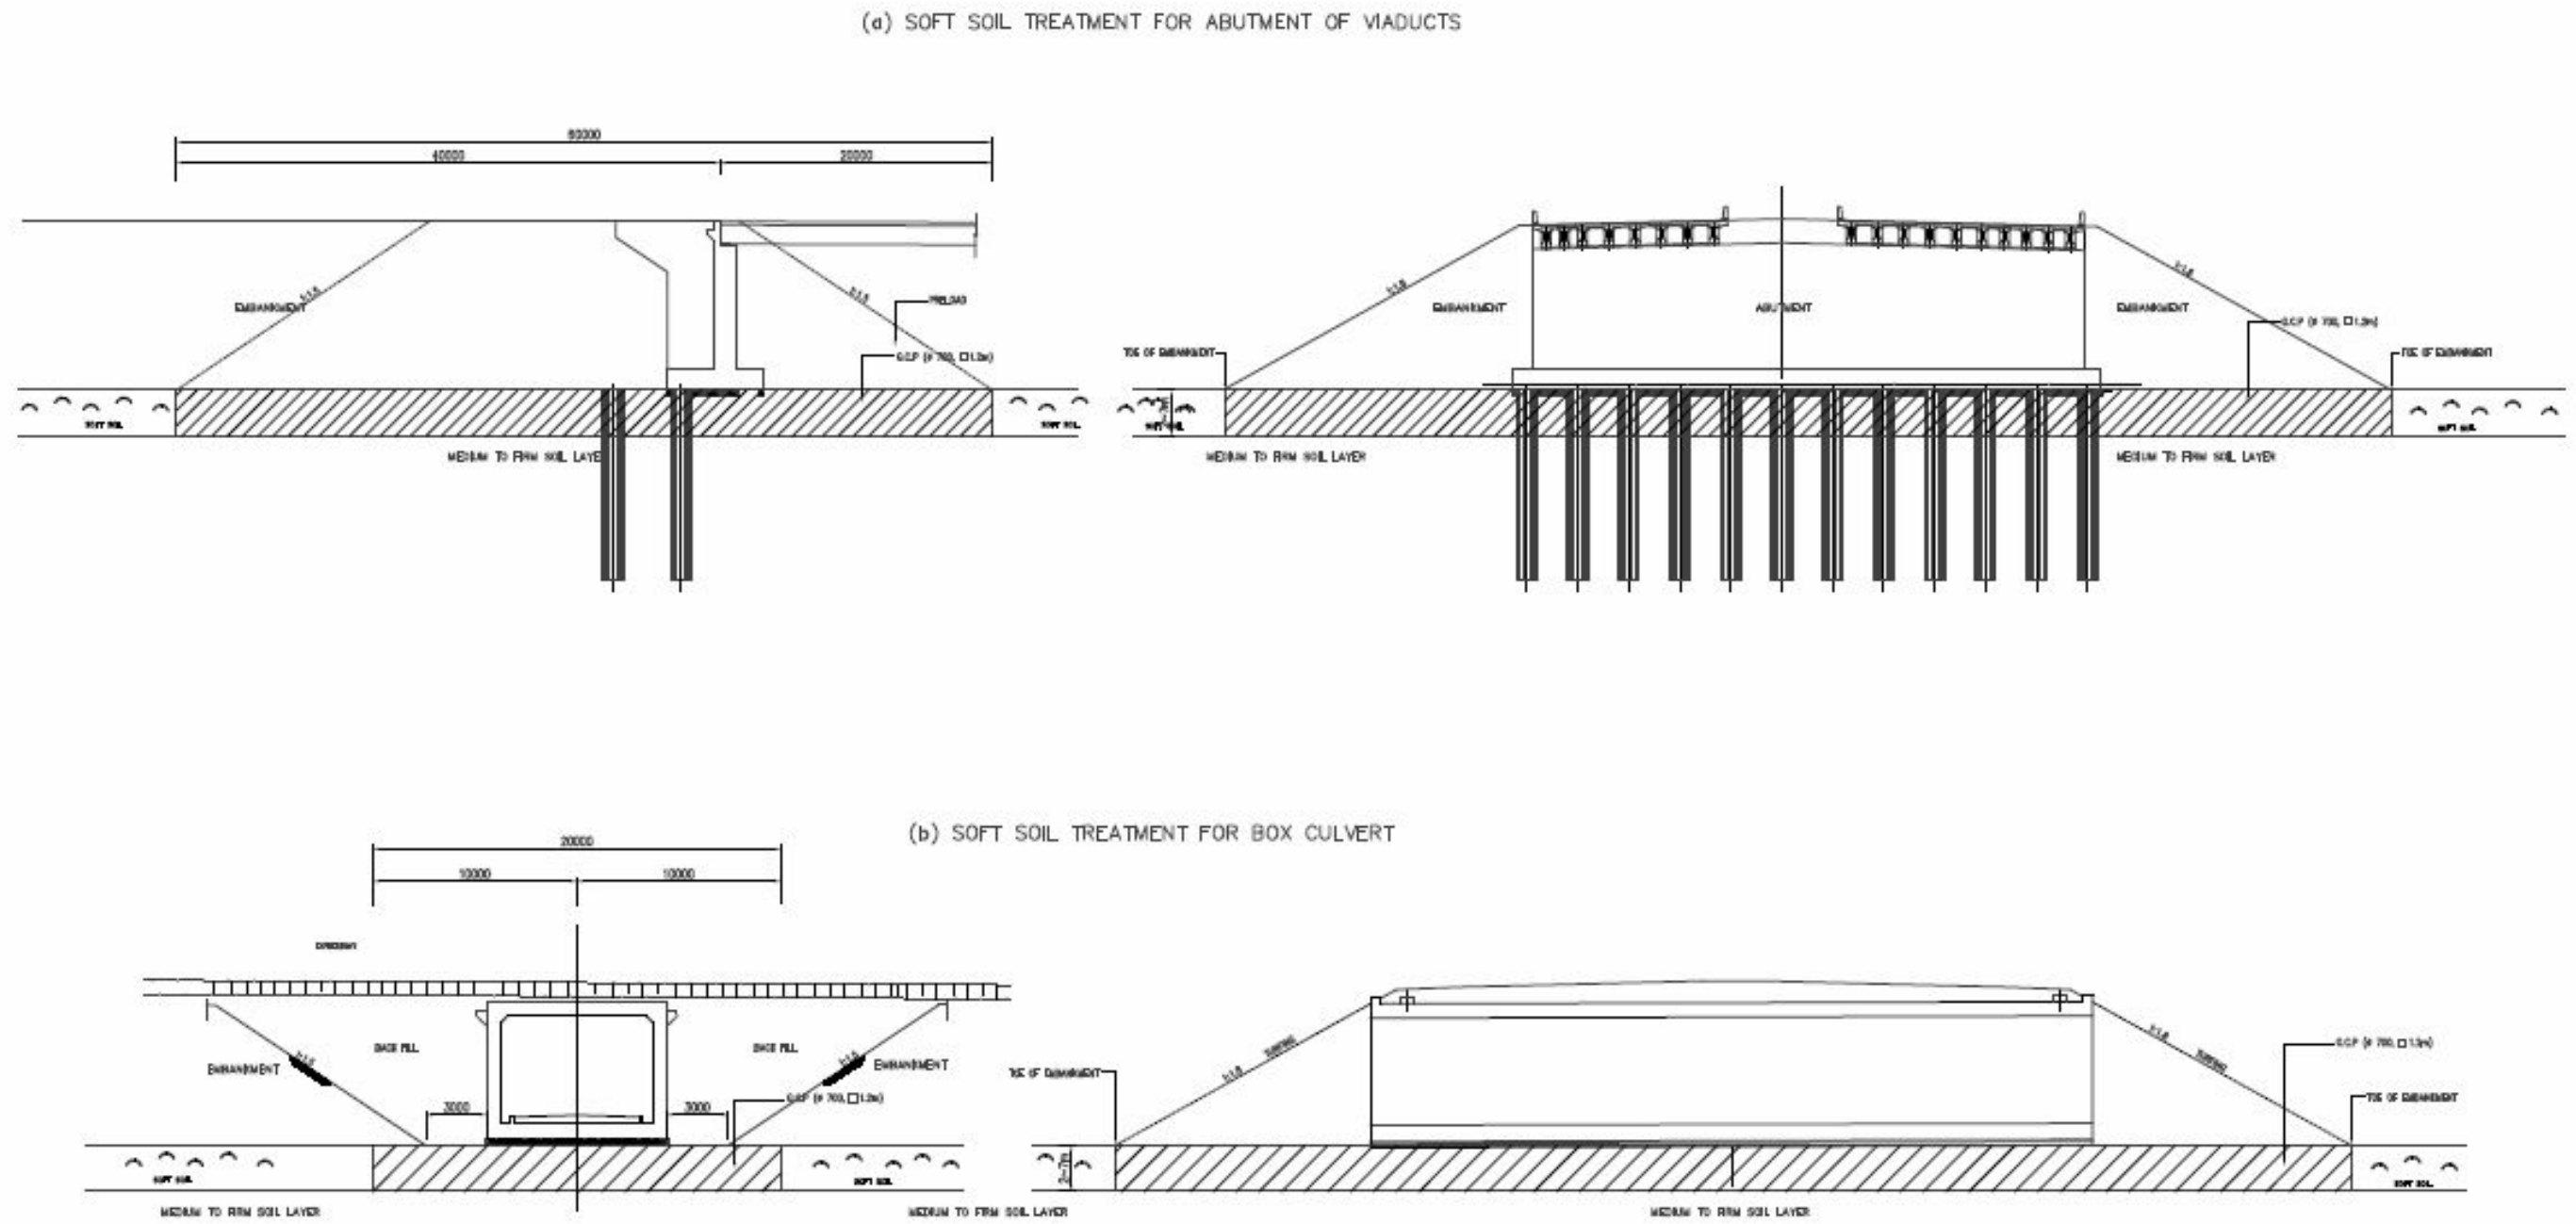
Soft Ground Treatment for Box Culvert and Abutment of Viaduct
